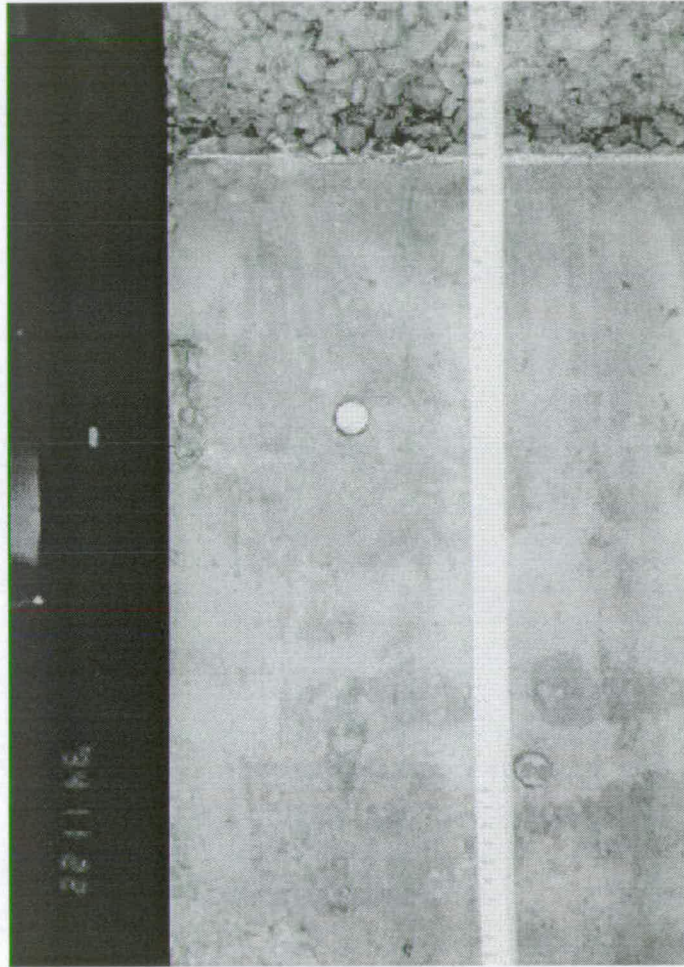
Concrete column: transition from 2nd to 3rd layer
